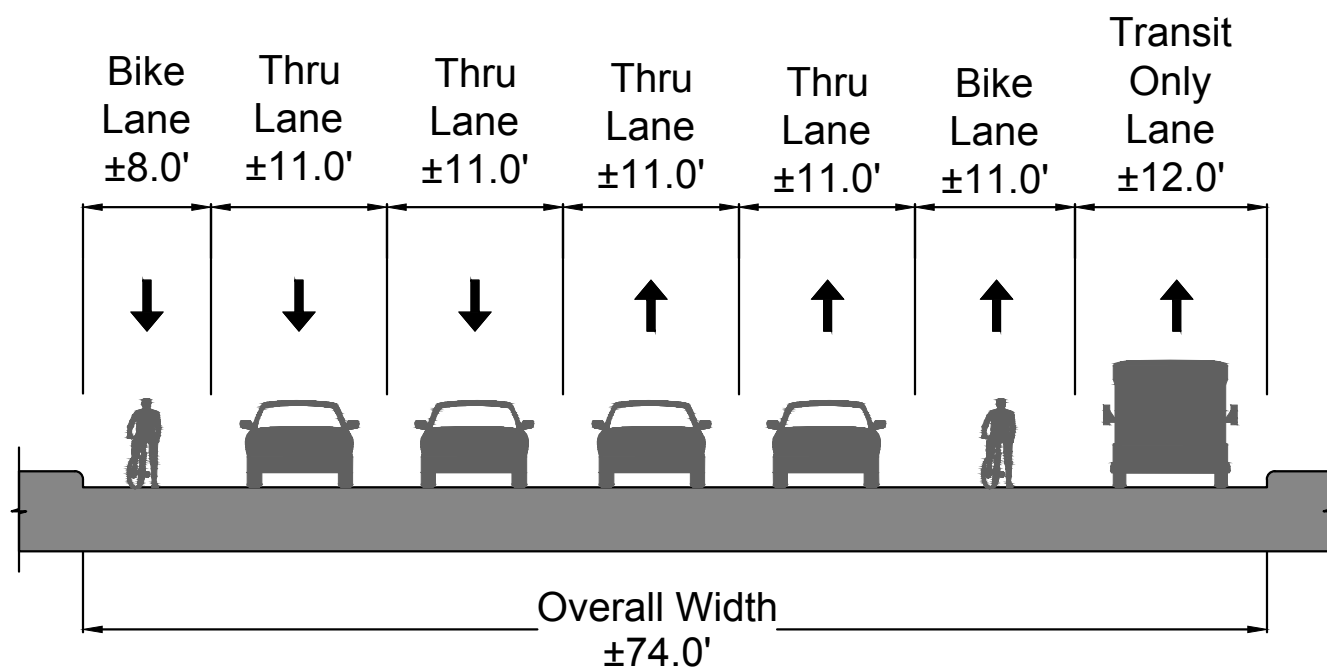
Typical Sections: Hennepin Avenue between Maple Street and Spruce Place
